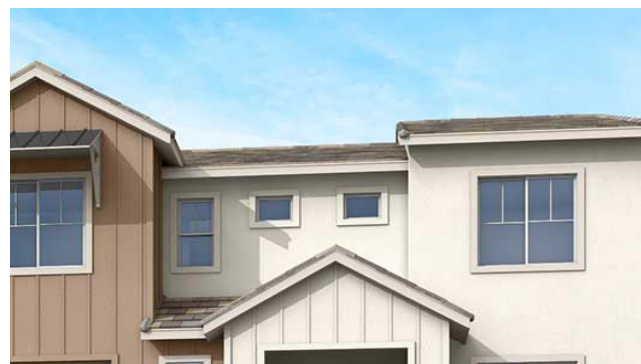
SUBURBAN TRADITIONAL ROOFS
